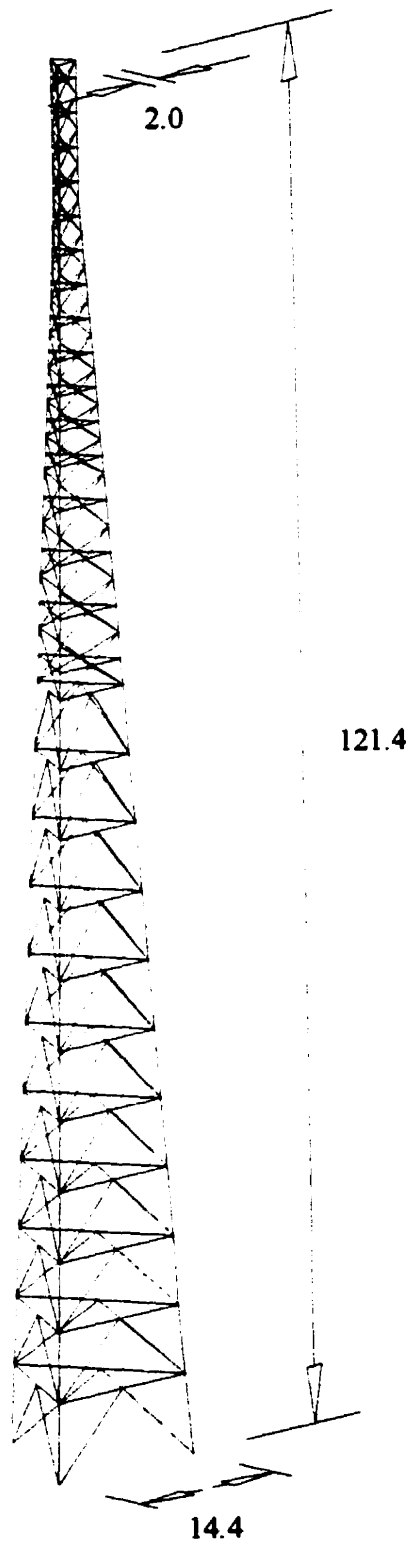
Layout of tower TC10 (dimensions are in m)
